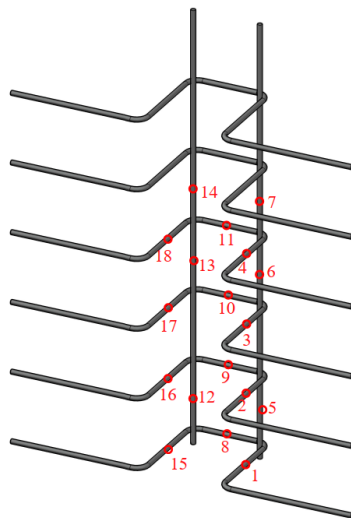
Strain Gauge Plan on Haunch Reinforcement
